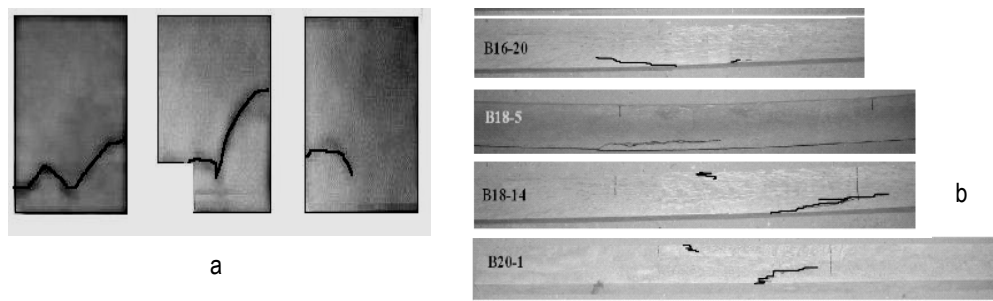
(a) Transversal crack pattern of flexure and shear failure area
